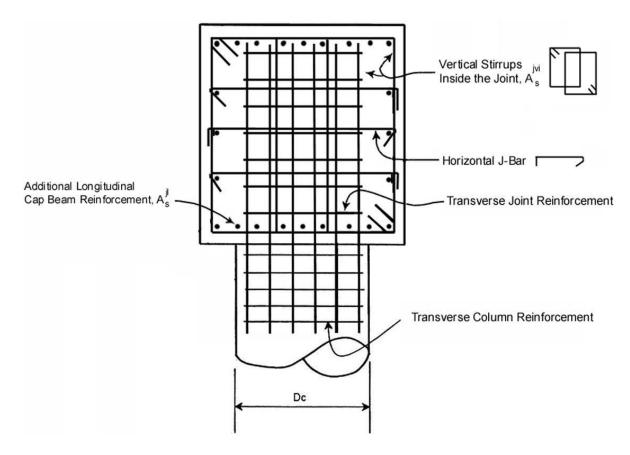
Cast-in-place Joint Shear Reinforcement Details
